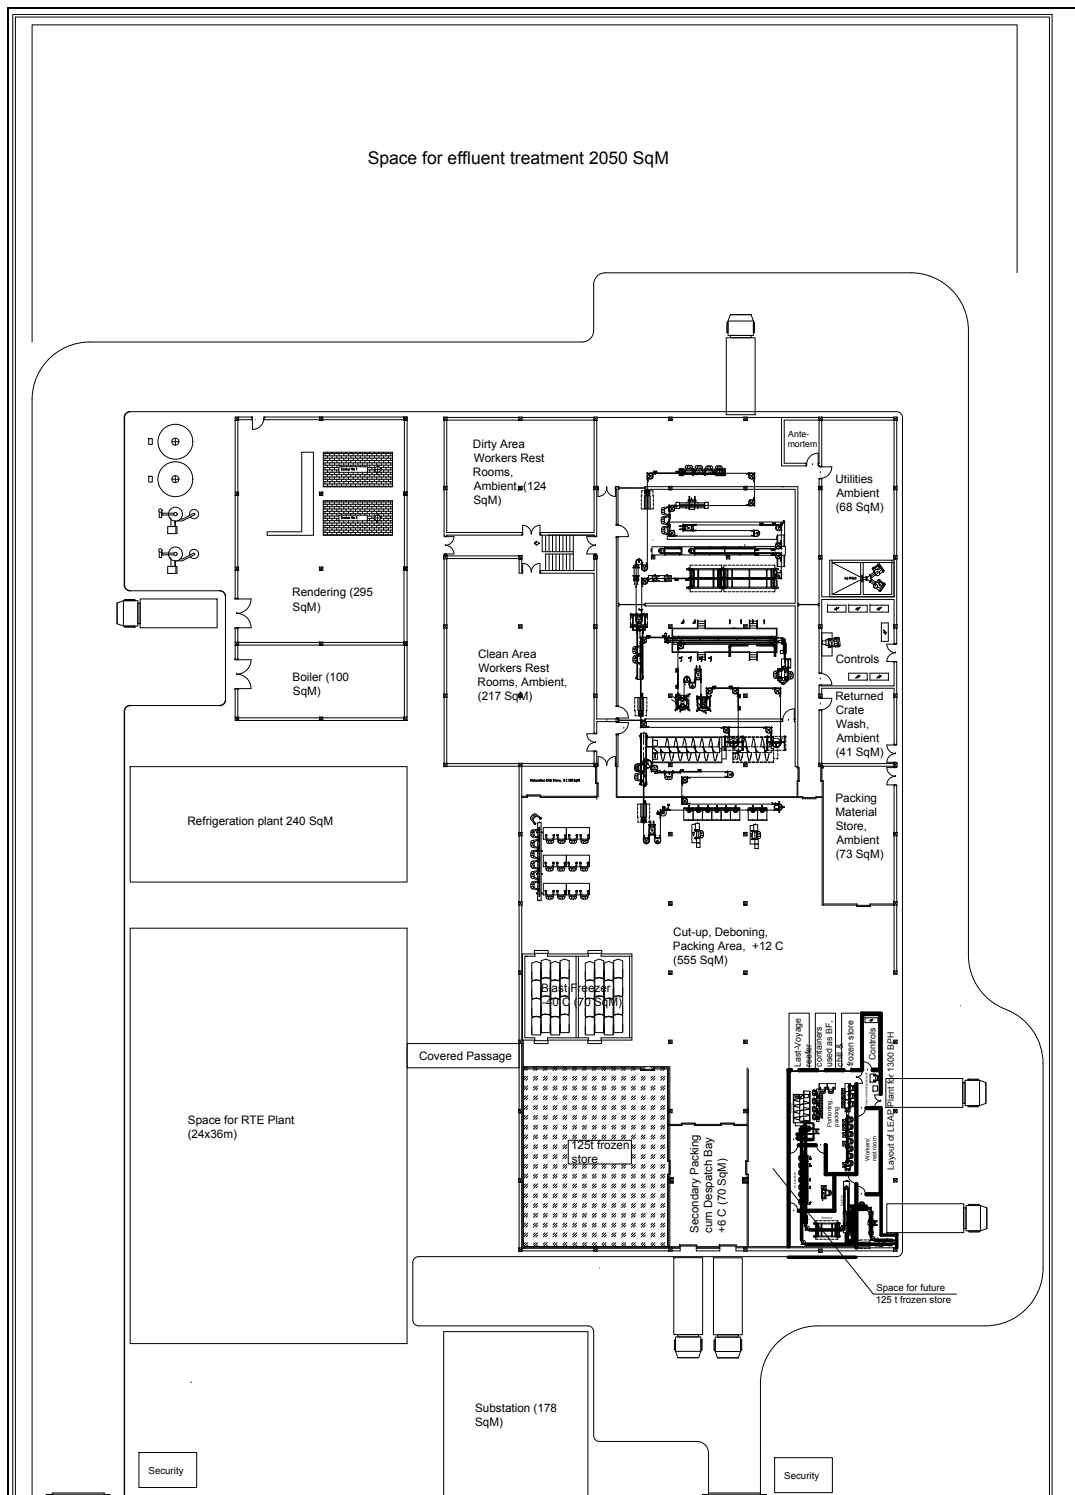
Plot plan showing the final 4000 BPH plant layout which figure 12 machinery will be upgraded into. Within the truss roof area of this layout you can see the initial 1300 BPH capacity layout. This drawing should give you an idea how much civil construction can be postponed to phase 2 if you begin with 1300 BPH LEAP layout.
